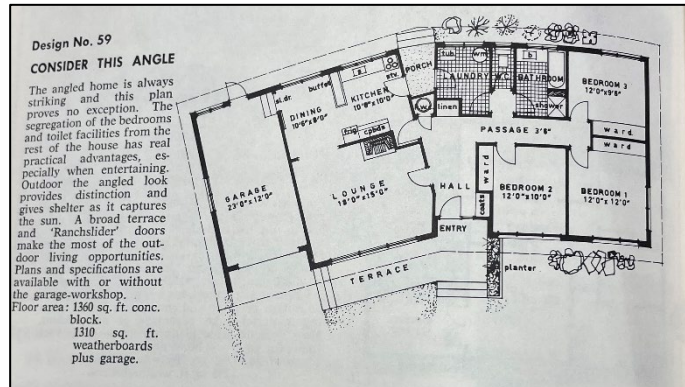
Excerpt from Leighton Carrad, *New Zealand Home Builder* (Auckland: Architectural Design Service, 1966).
